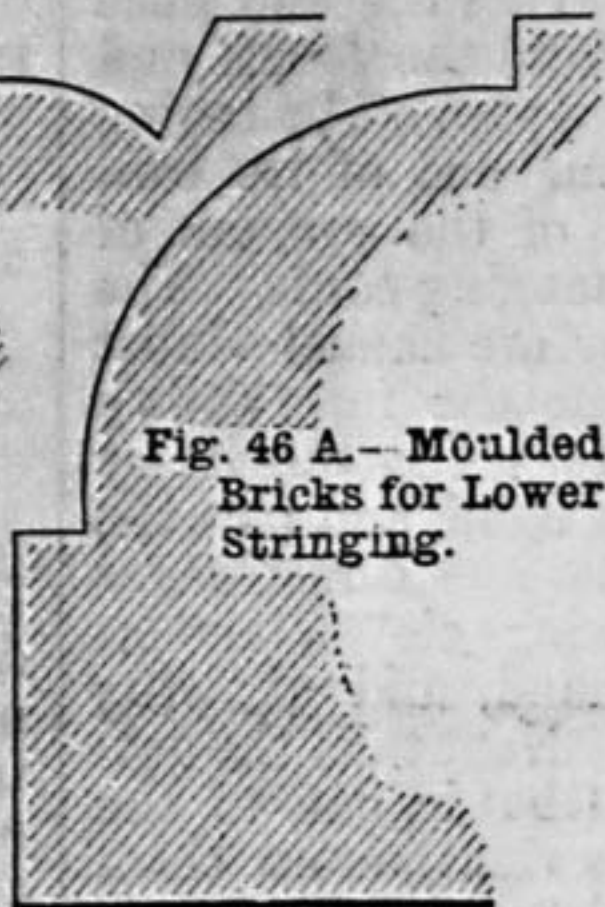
A.—Moulded Bricks for Lower Stringing.
